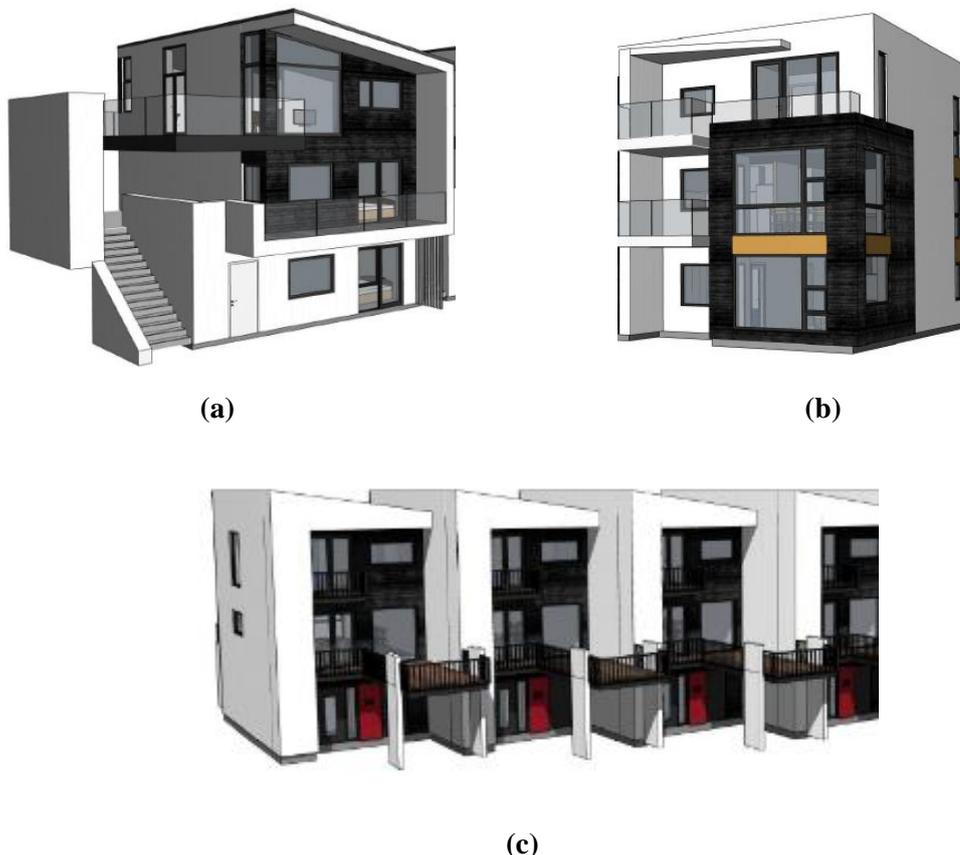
Simplified sketches of the constructed buildings, (a) single-family house, (b) two-family house, and (c) row house.
